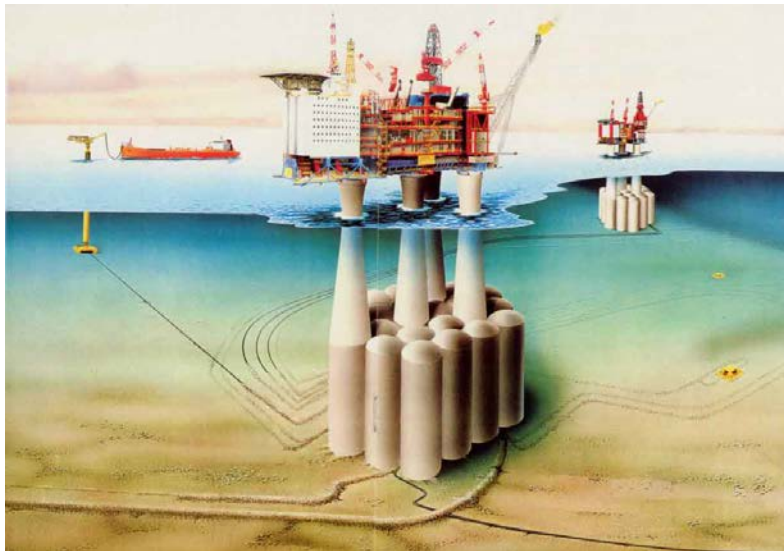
A Concrete Gravity Structure and Platform. Taken from web link: www-it.jwes.or.jp
